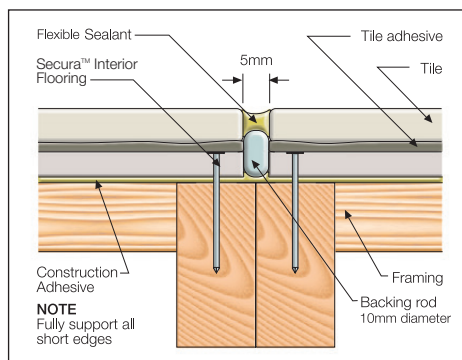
CONTROL JOINTS - SHEET & TILE JOINT
